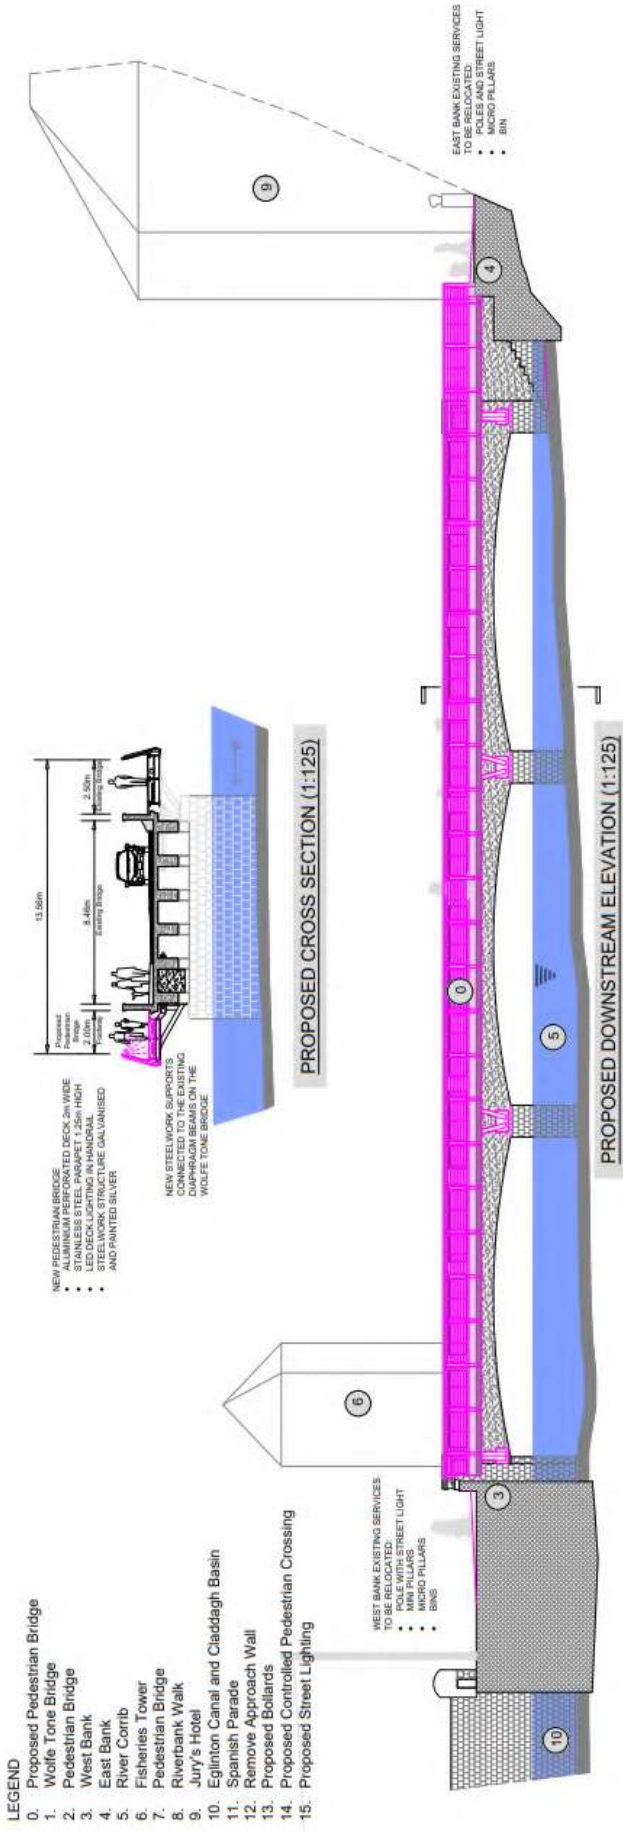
Proposed Footbridge Design and Wolfe Tone Bridge
